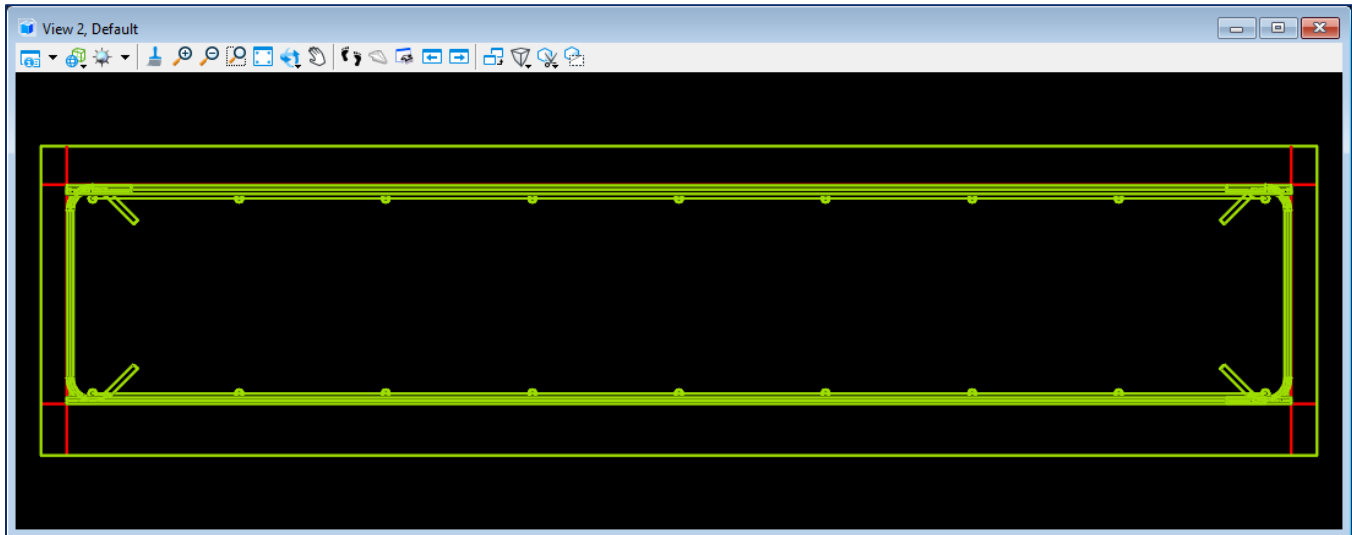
Substructure Cross Section with Placed Reinforcement Inside Cover Lines
